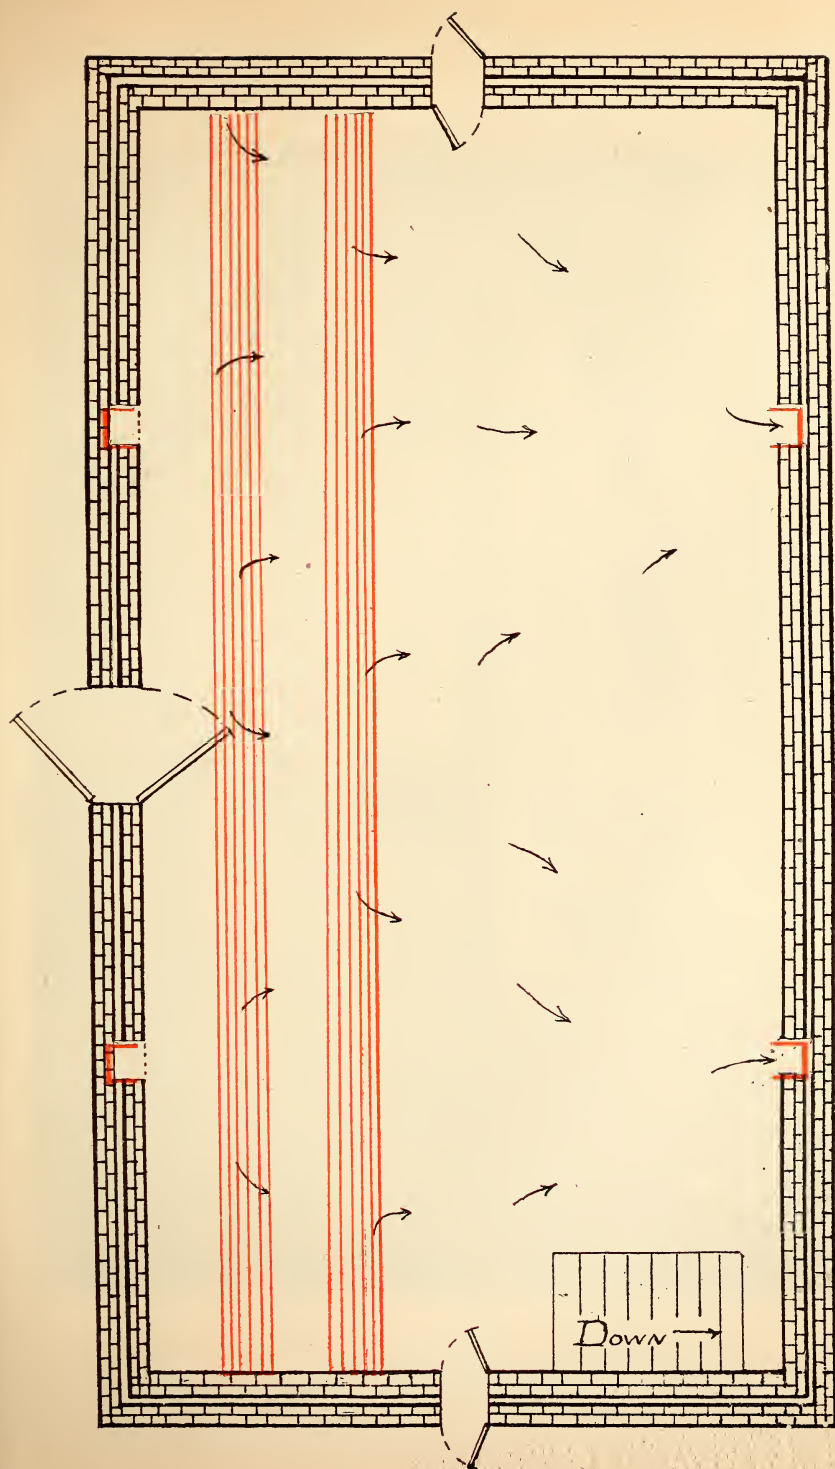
Upper story of Mr. J. R. Sams' apple storage house, showing ventilation through slatted portion of floor.
